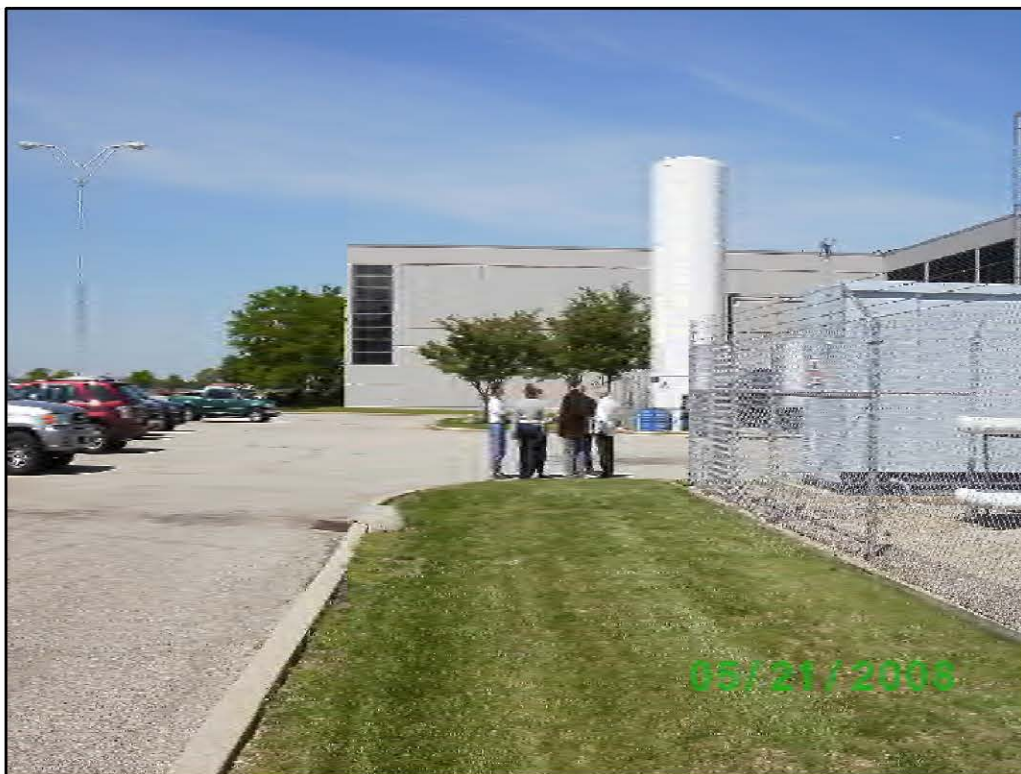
View of Proposed AAFRF location, looking west toward Facility 20490 and the nitrogen storage tank.
